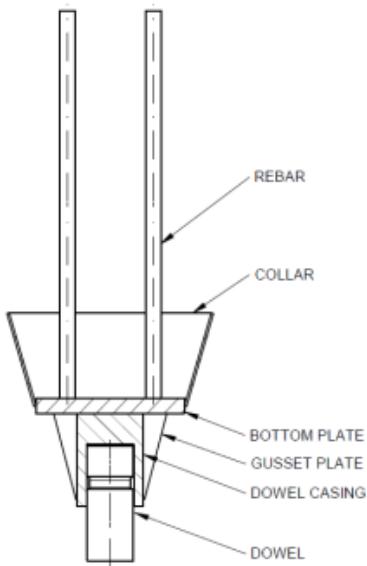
Rock shoe for precast concrete piles, principal drawing.
